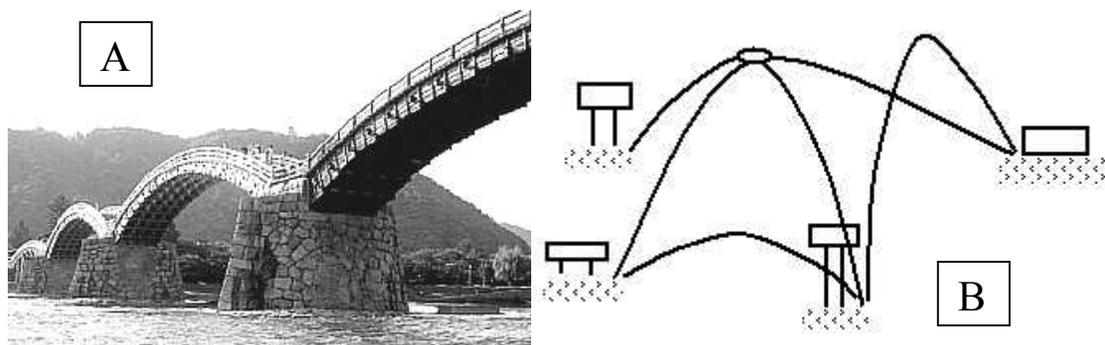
A: Kintaikyo bridge (1673), Japan. B: Imaginary “Exercise Campus” of towers and bridges.
